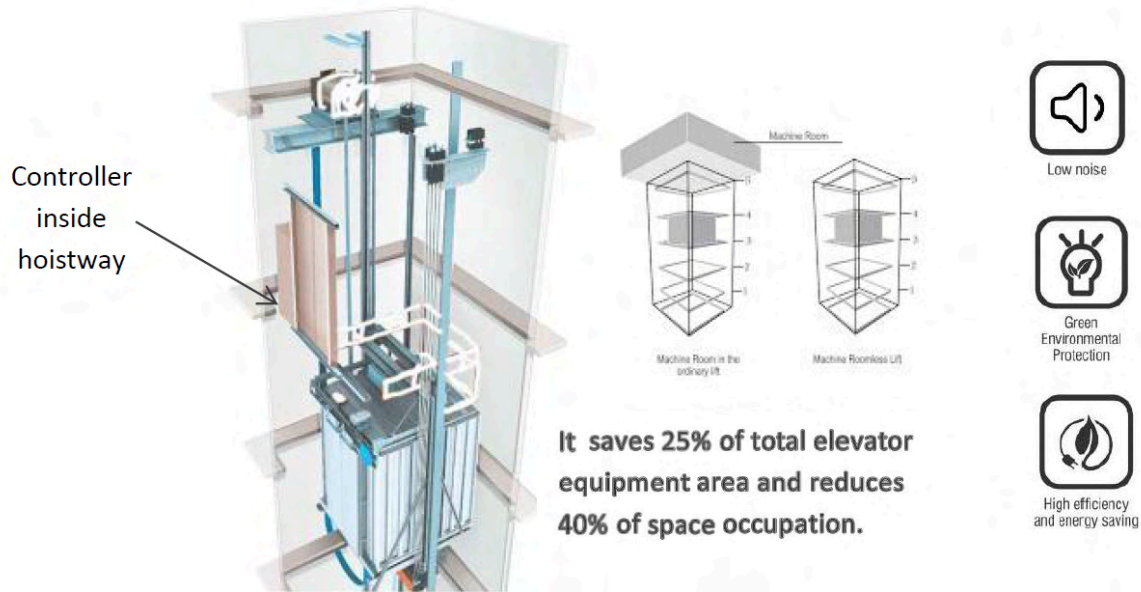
Machine Room Less Elevators showing compact motor drive attached with the car itself, which increases usable spaces (Source:<http://tandemtechnologies.in/product-detail/mrl-elevator/7/>)
